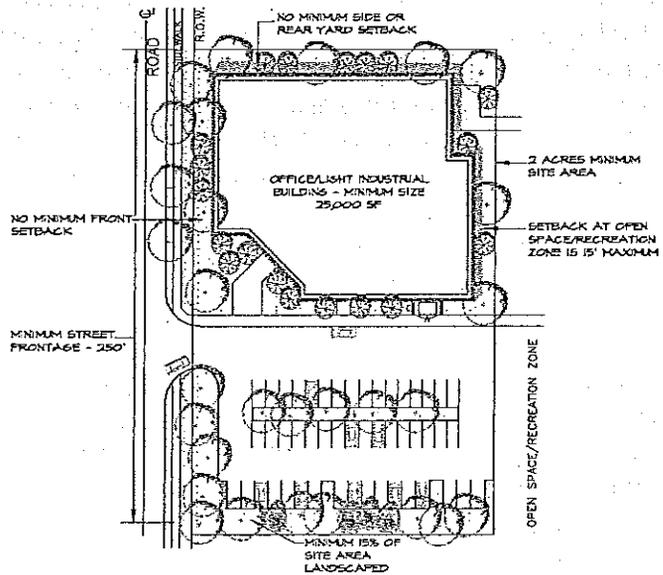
TYPICAL SITE LAYOUT OFFICE / LIGHT INDUSTRIAL LAND USE AREA
